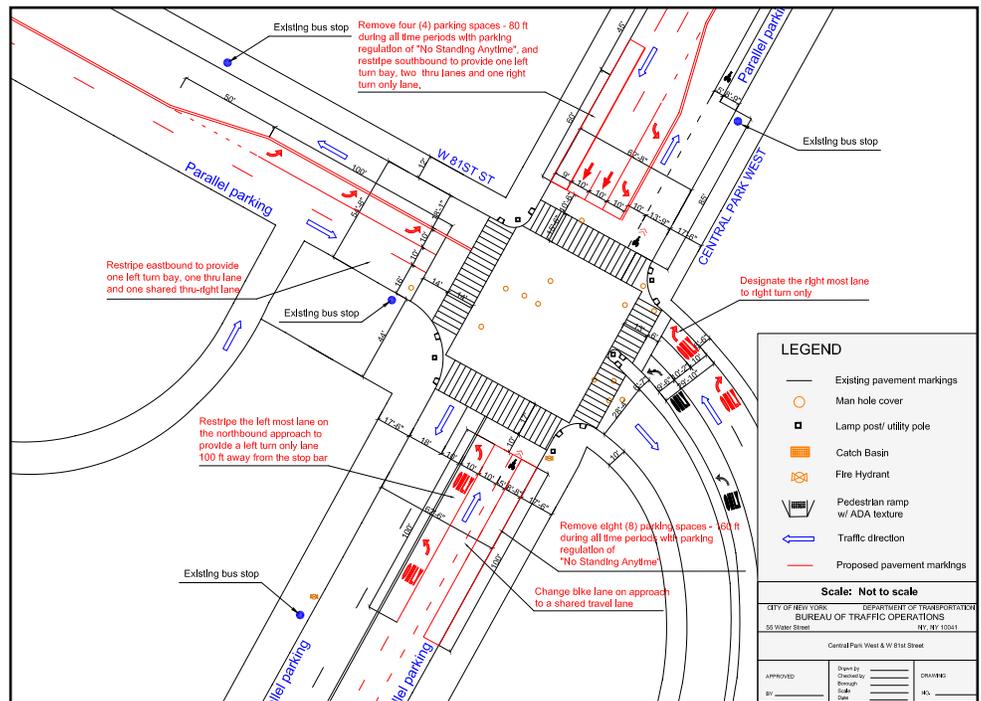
Proposed Roadway Configuration - Central Park West & West 81st Street
